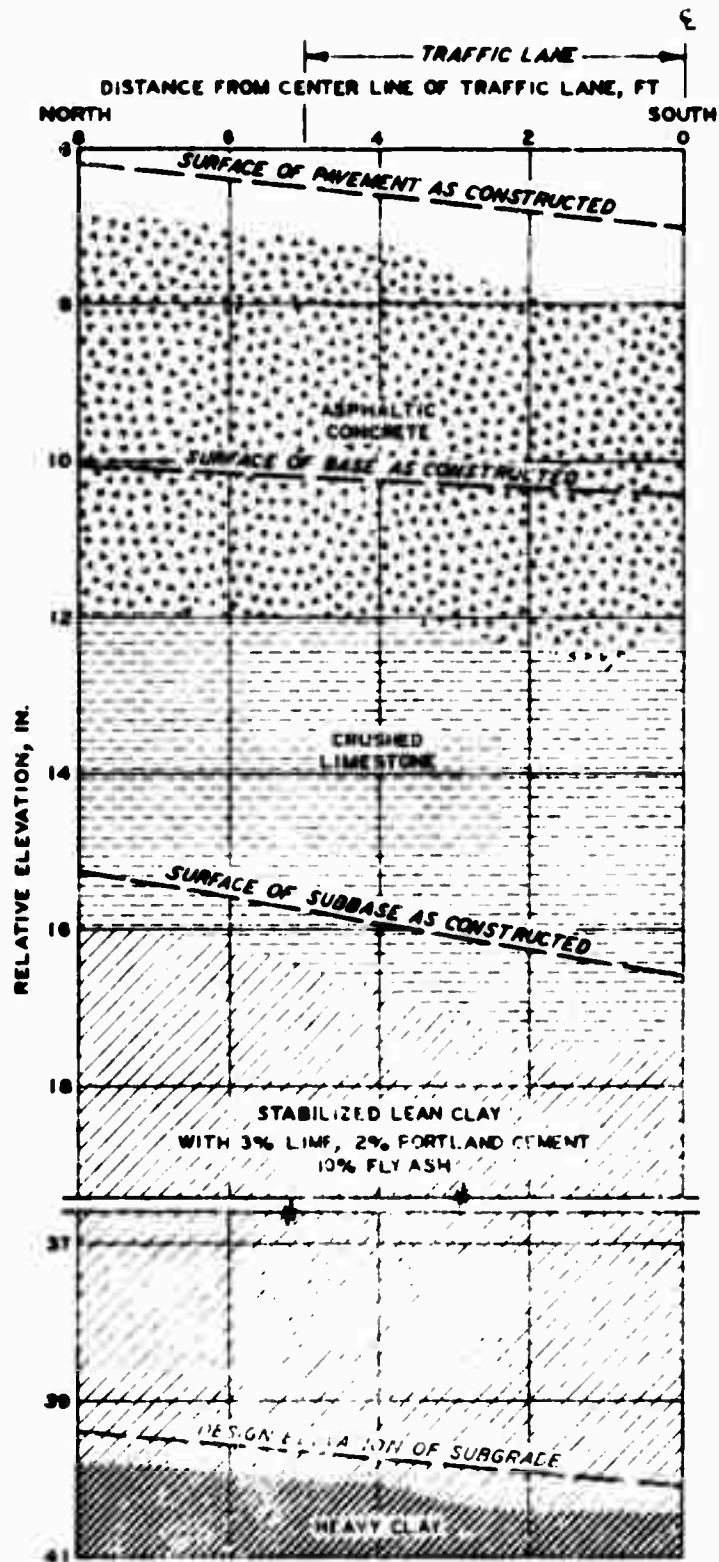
Test pit profile of item 1, lane 1, flexible pavement test section. Station 0+26.5 after 3660 coverages of 200-kip twin-tandem assembly
